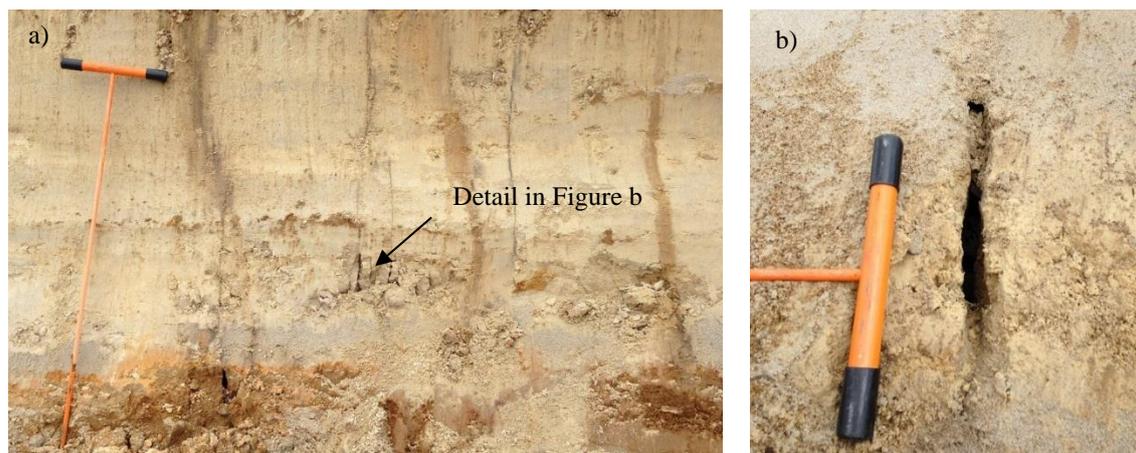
Small-scale piping along subvertical fractures on the west wall of the excavation.
